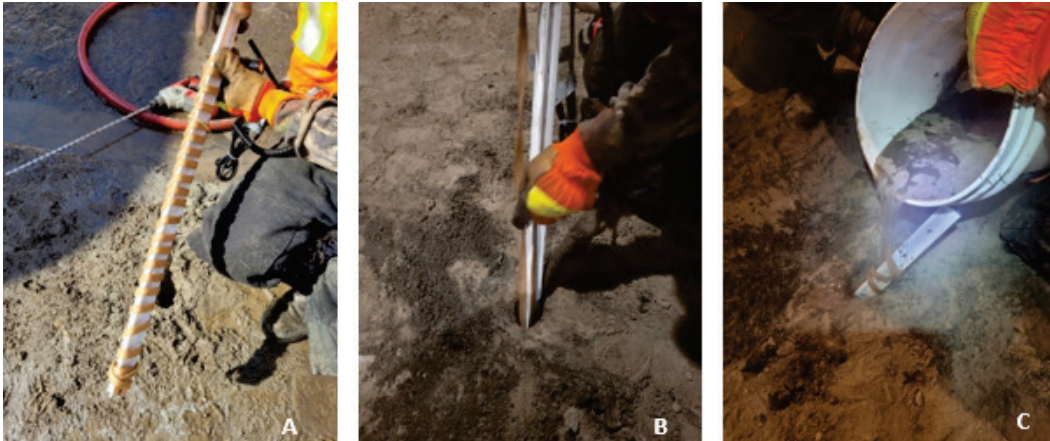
Arrowhead anchor installation. (A) Drive rod nested against arrowhead. (B) Two operators needed to install.
